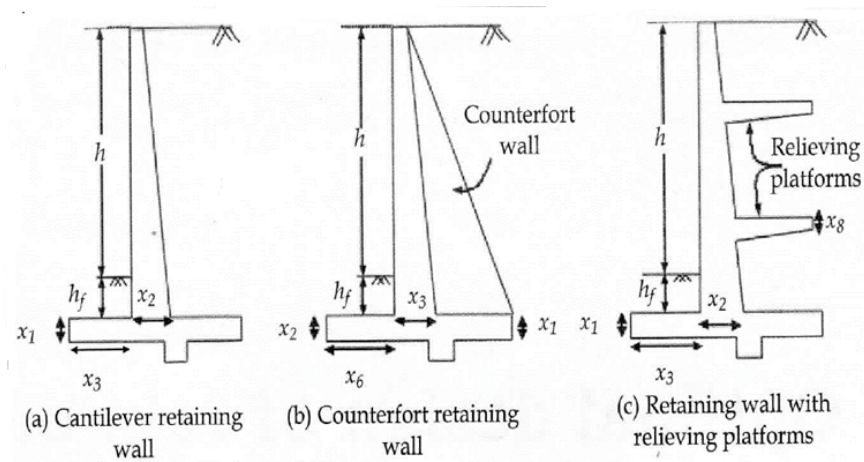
Reinforced Concrete Walls (Donkada and Menon, 2012).
